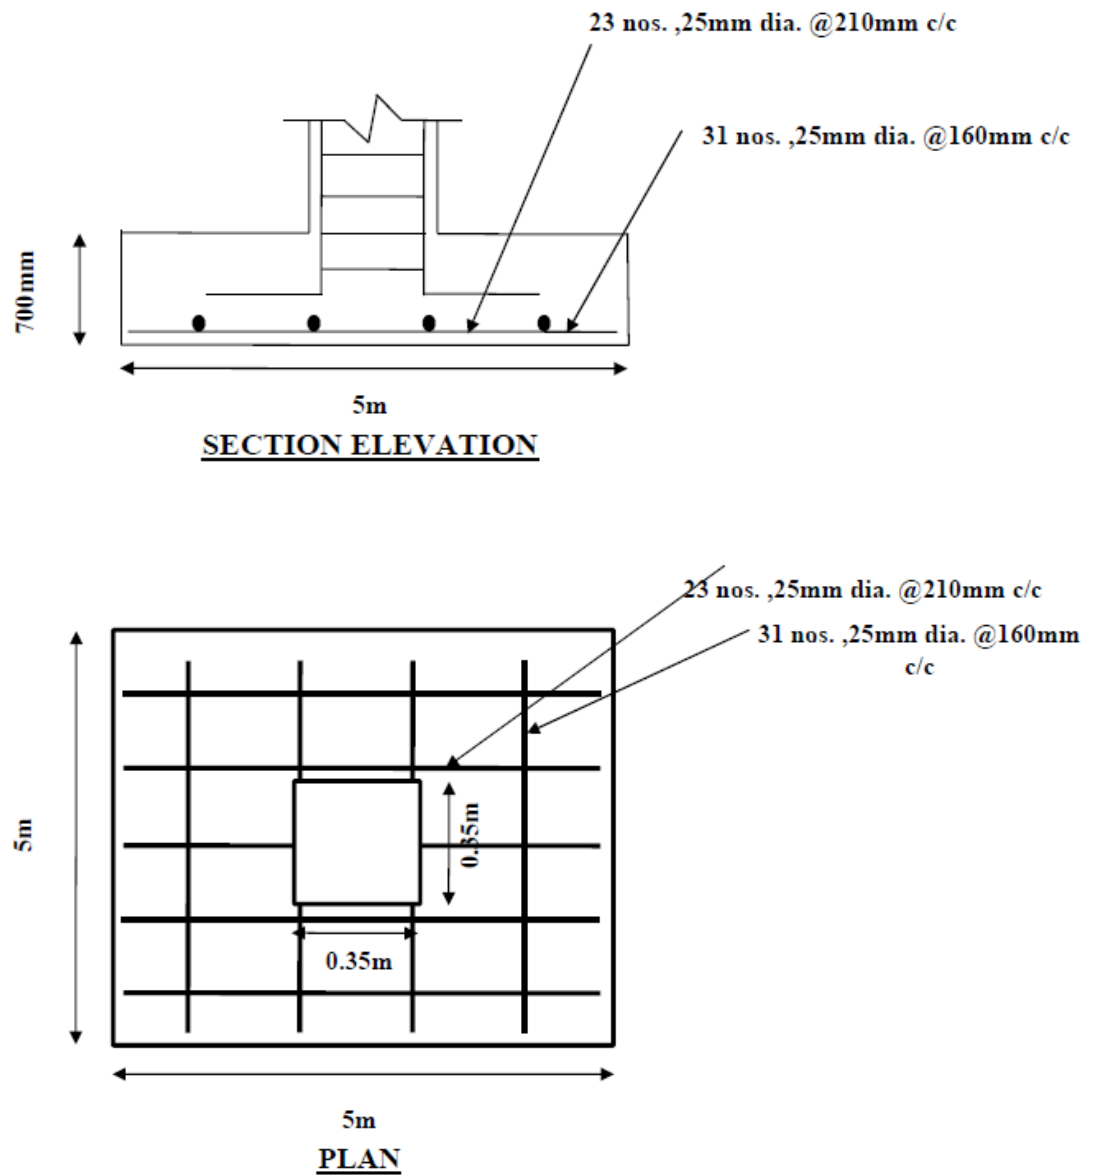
8 Spread sheet sowing dimensions of spread footing
